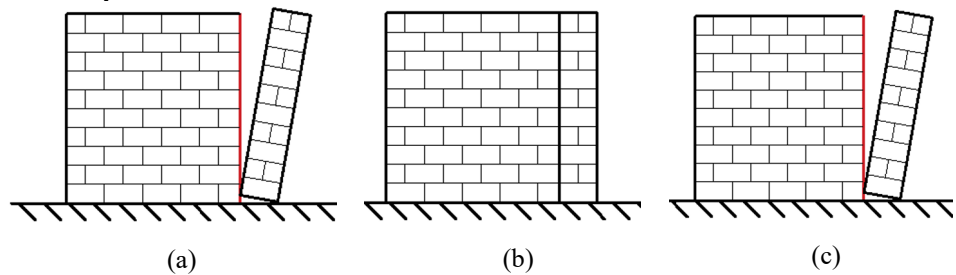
Cantilever façade experiencing one-sided rocking motion, with impacts occurring between the façade and the return wall. In detail, (a) happens first, next (b), and finally (c).
